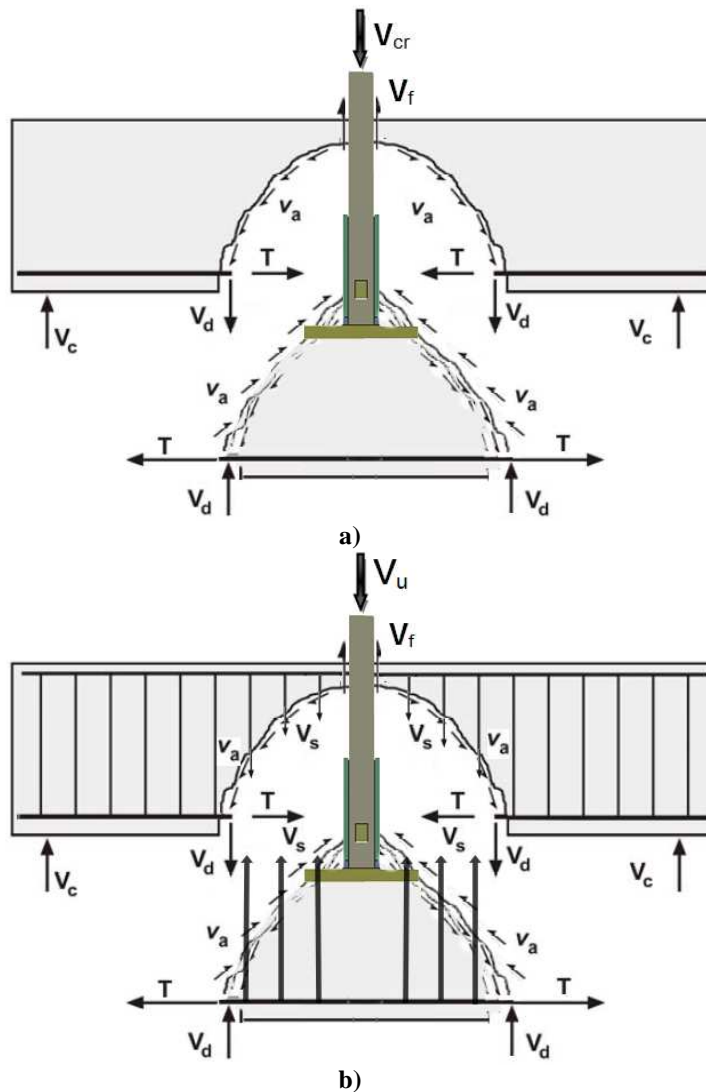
7 Load transfer mechanism for the connection: a) without stirrups; and b) with stirrups)
